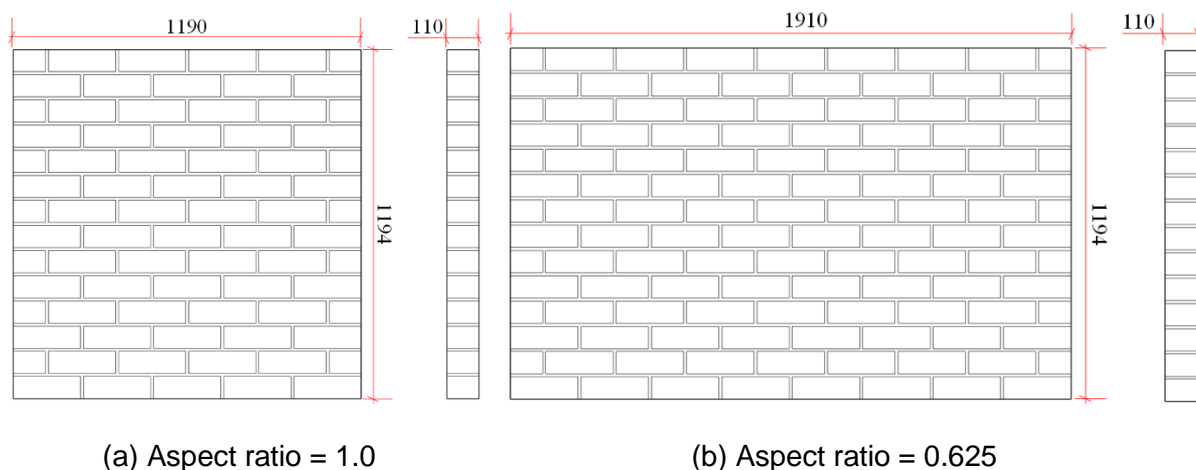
Proposed geometry of URM wall specimens (all dimensions are in mm).
